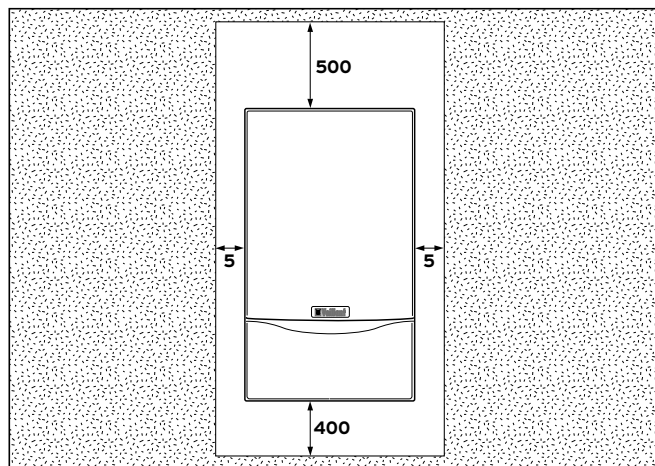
Required minimum gaps/assembly clearances (mm)
